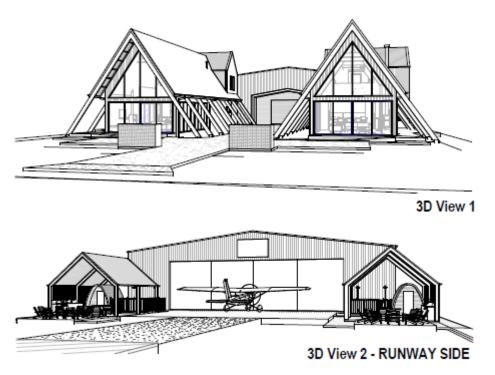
Shows elevations of the accommodation buildings fronting Mill Road and the hangar/recreation facilities facing the runway.
